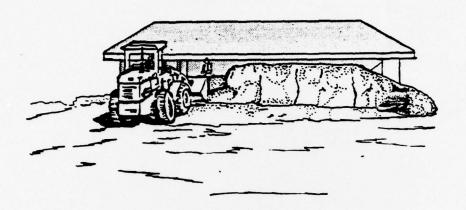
PLACING BERM AROUND EXTERIOR WALLS.
